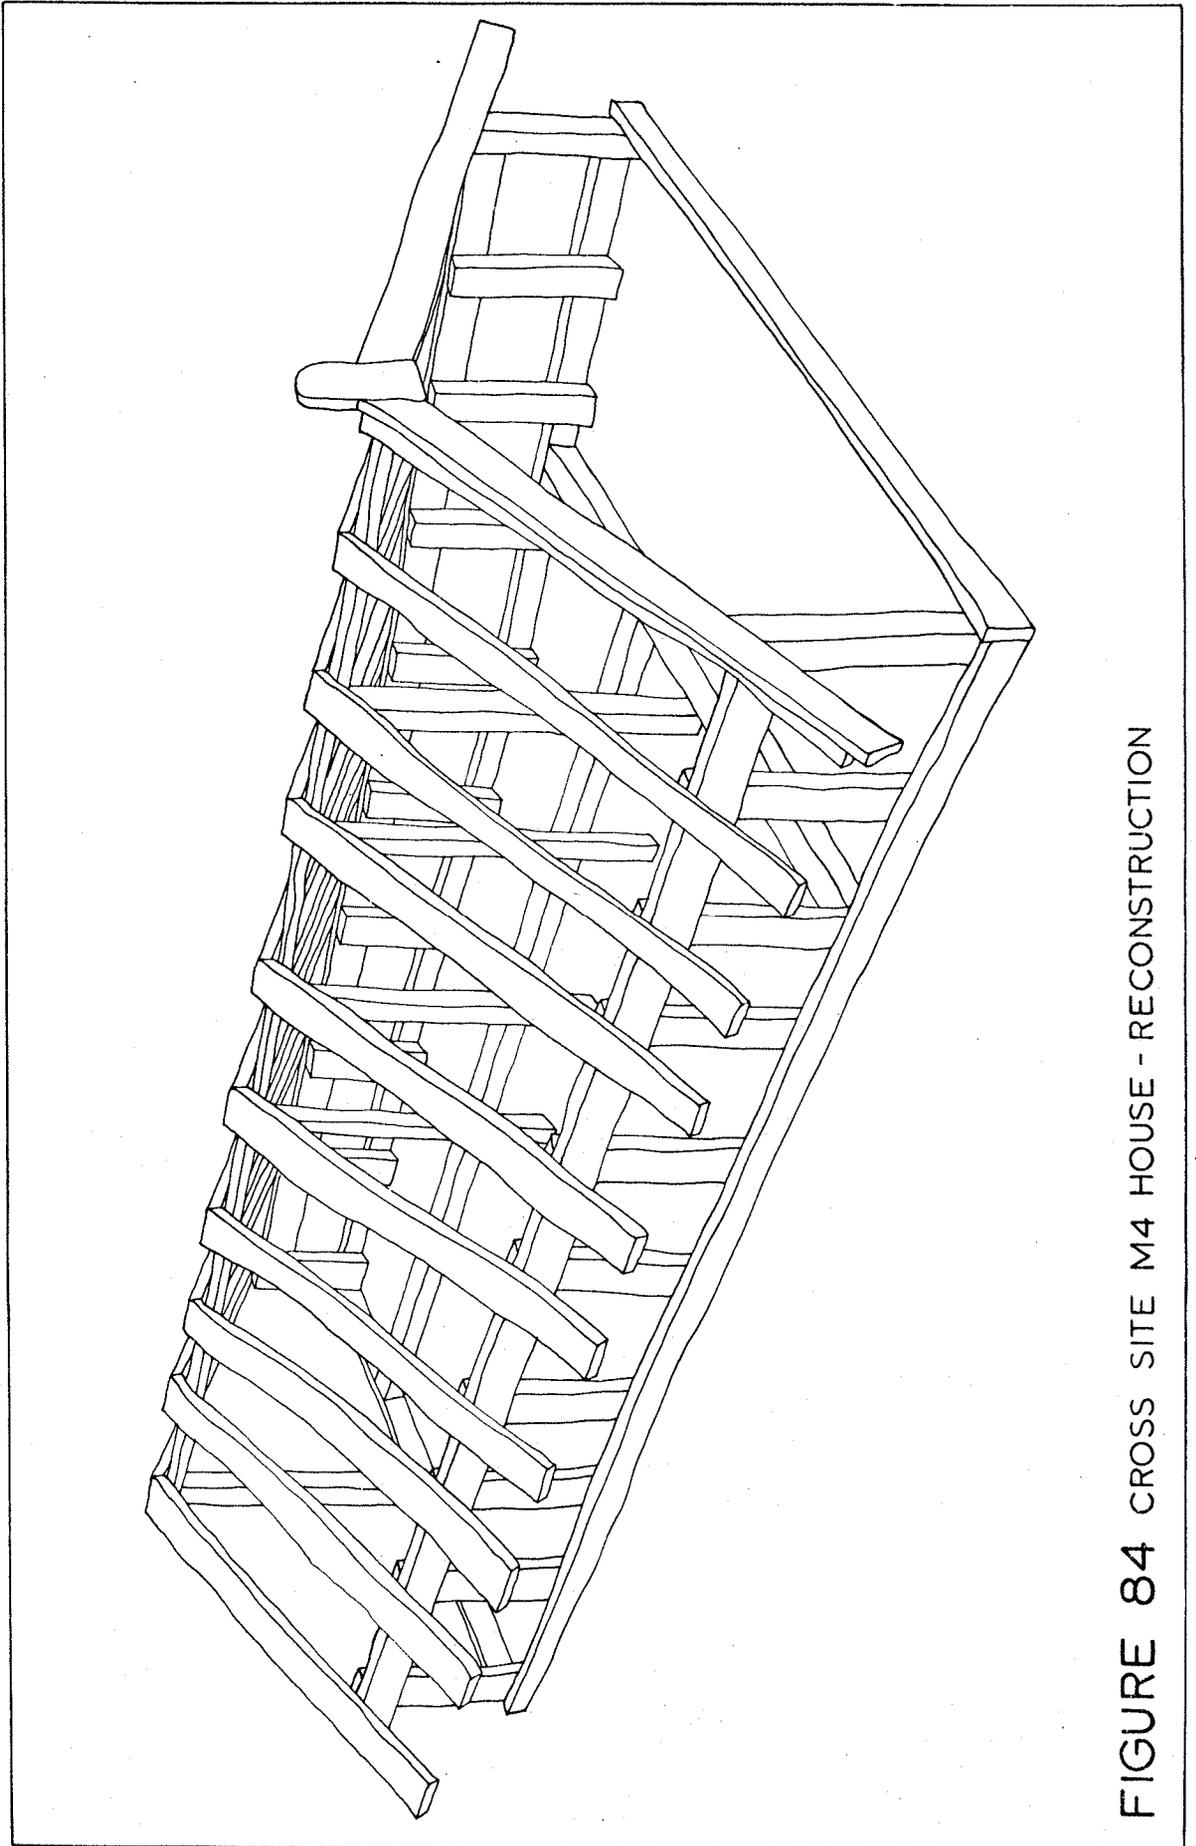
CROSS SITE M4 HOUSE - RECONSTRUCTION
